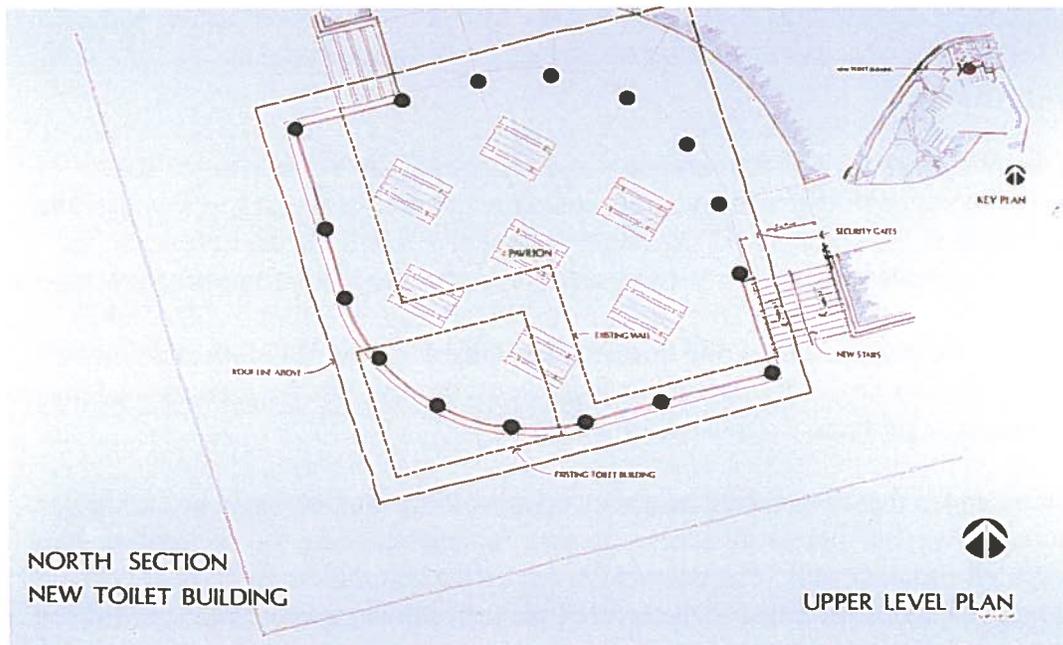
Public Overlook – North Section Slip Tenant Restrooms
